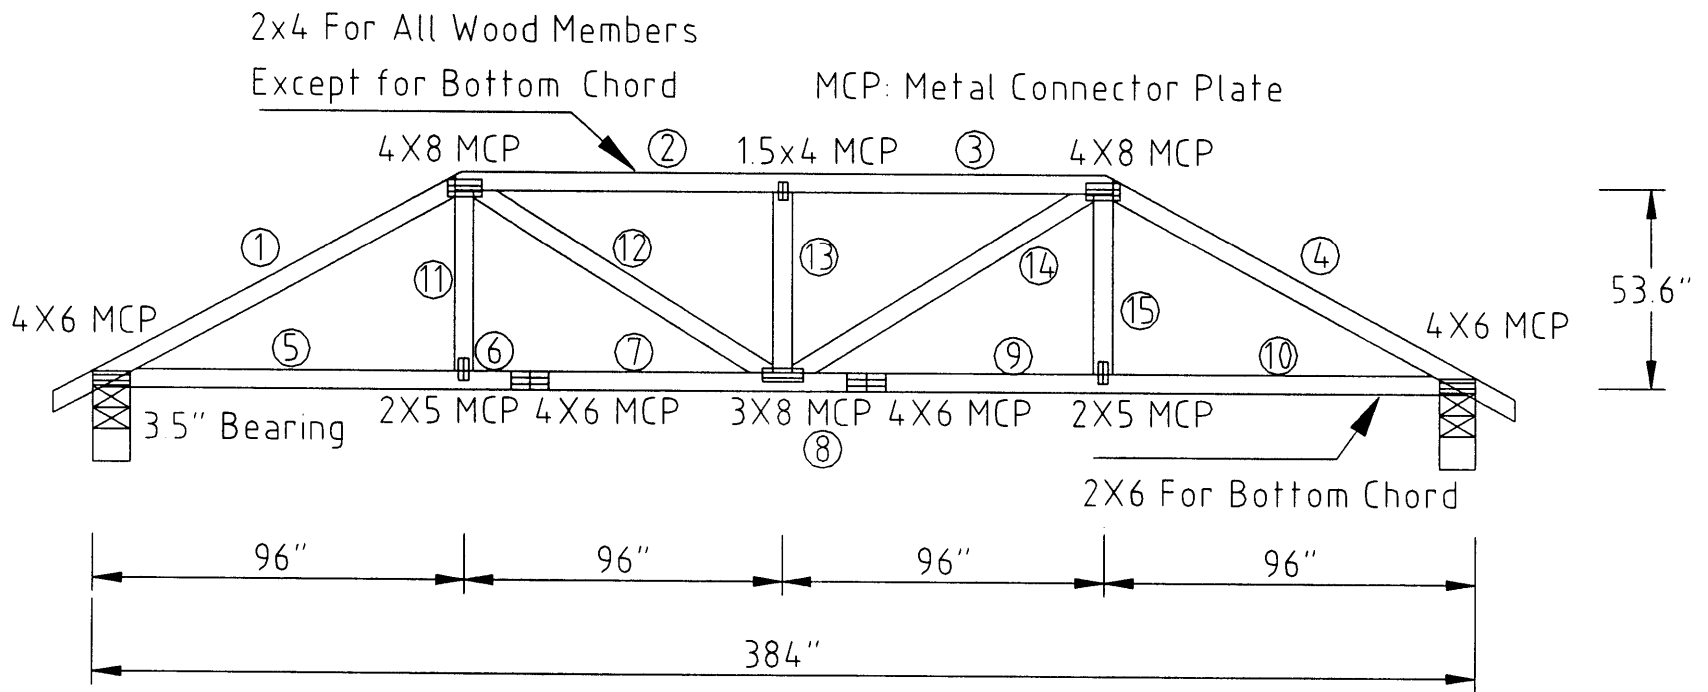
MPC Truss Type ASGR from a Truss Plate Manufacturer
